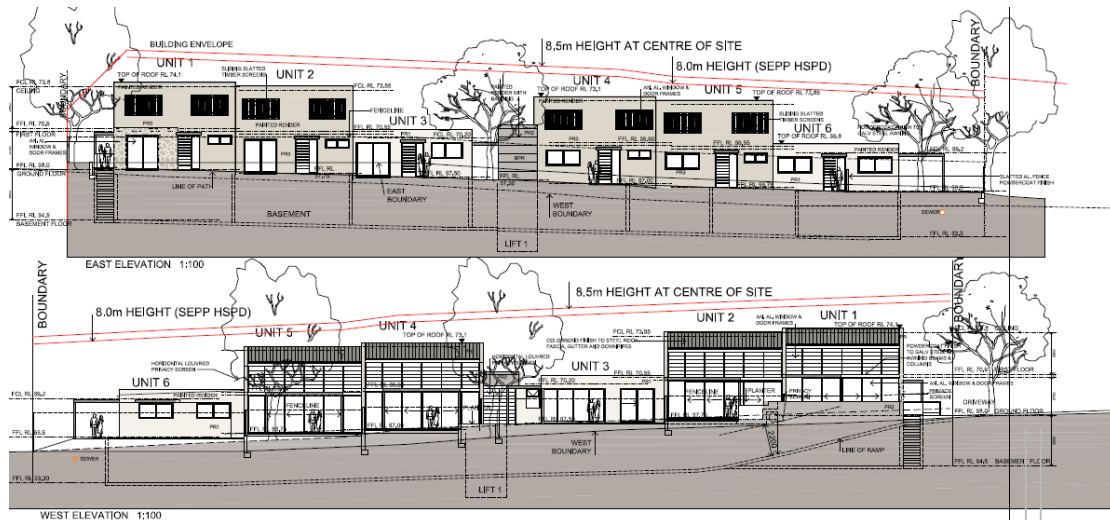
Plan extract showing relationship of building to 8.5 metre height standard.
